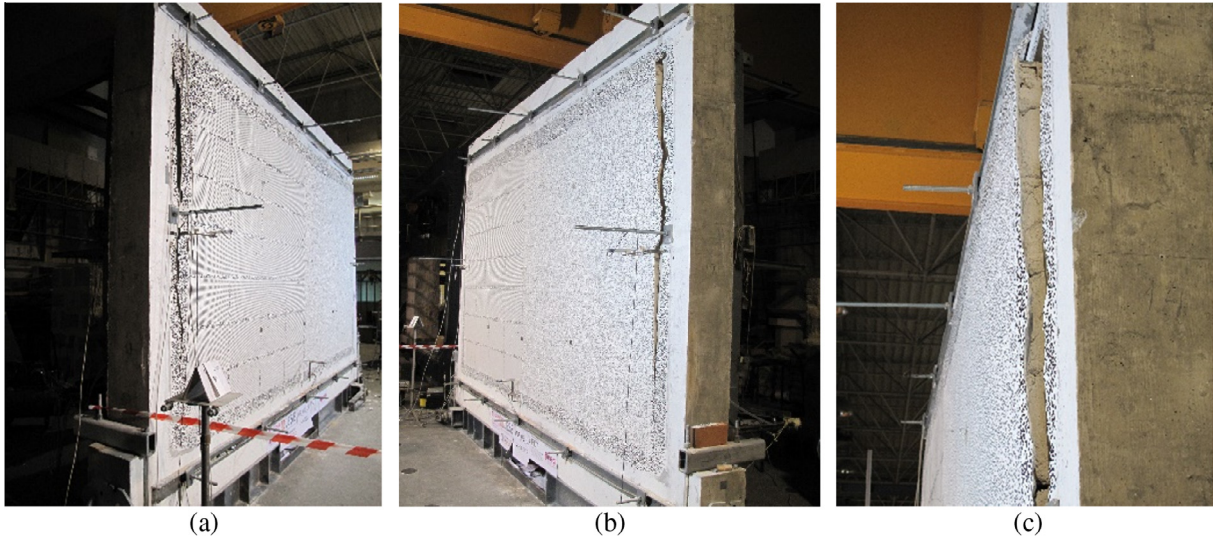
Inf_03 out-of-plane test damage: (a) left view, (b) right view and (c) zoom of the detachment of the infill panel.
